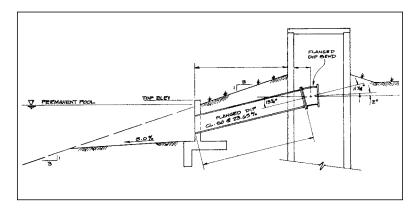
Reverse Slope Pipe Outlet
